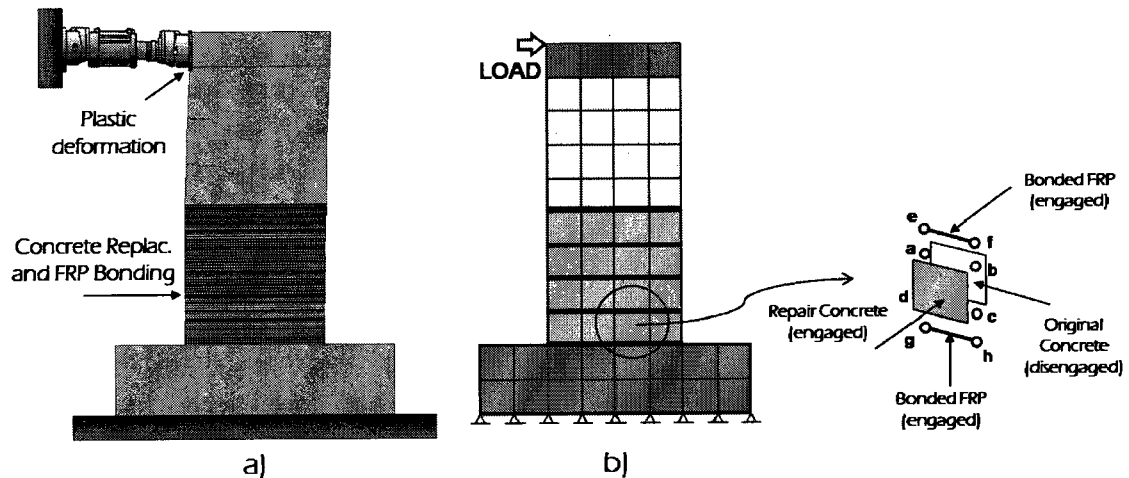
Modelling of Repaired/Retrofitted Shear Wall: a) Specimen; b) FE Model
